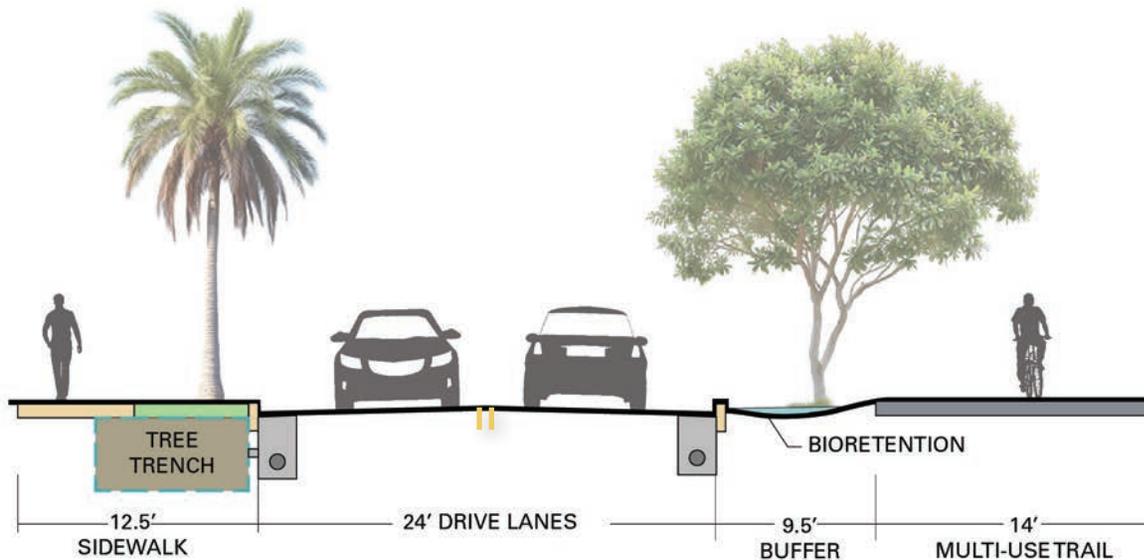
Option 2: Eliminating the center vehicular turn lane where possible provides additional room to add landscape and green stormwater infrastructure elements such as tree trenches and bioretention into the buffer spaces. This option shifts the curb on both sides of Estero Blvd to repurpose existing pavement.
